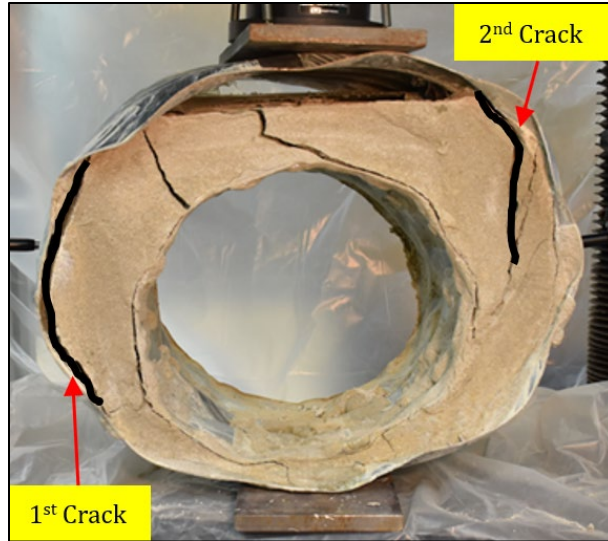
Initial Cracks of Sliplined Culvert with C40 Cellular Grout with Voids at the Crown.
